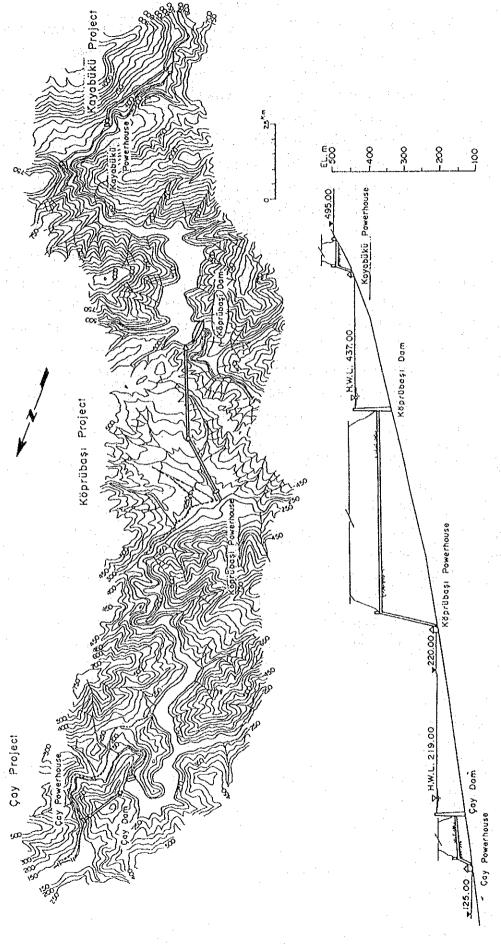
Devrek River Hydroelectric Power Development Plan in Master Plan Report
